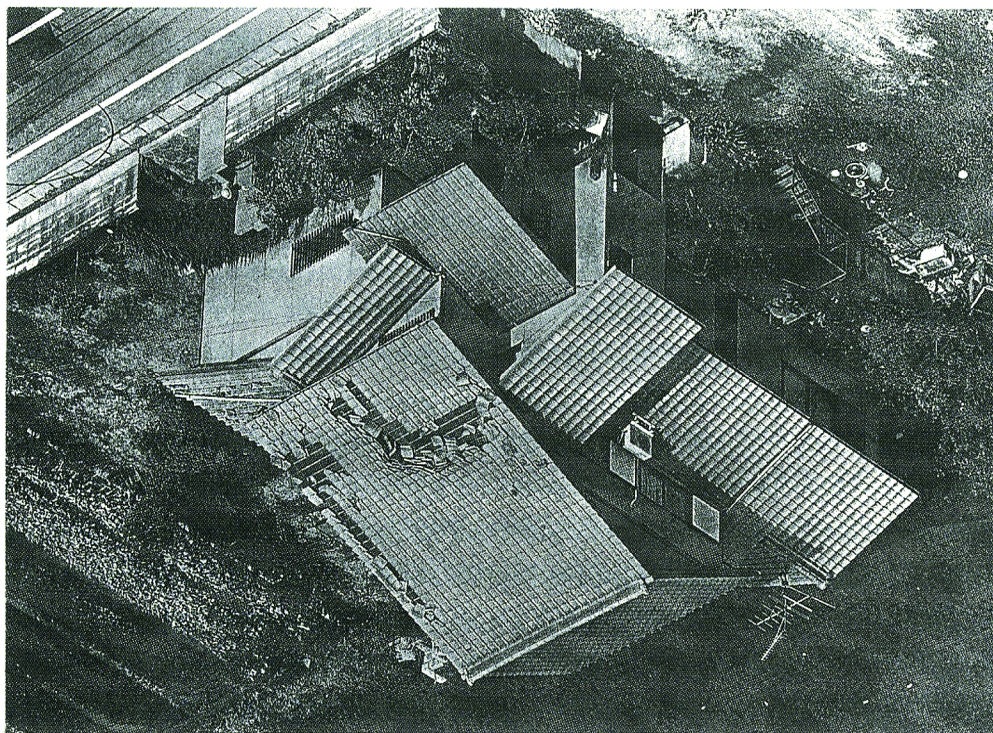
Roof damage (by the courtesy of Sanyo Press).
